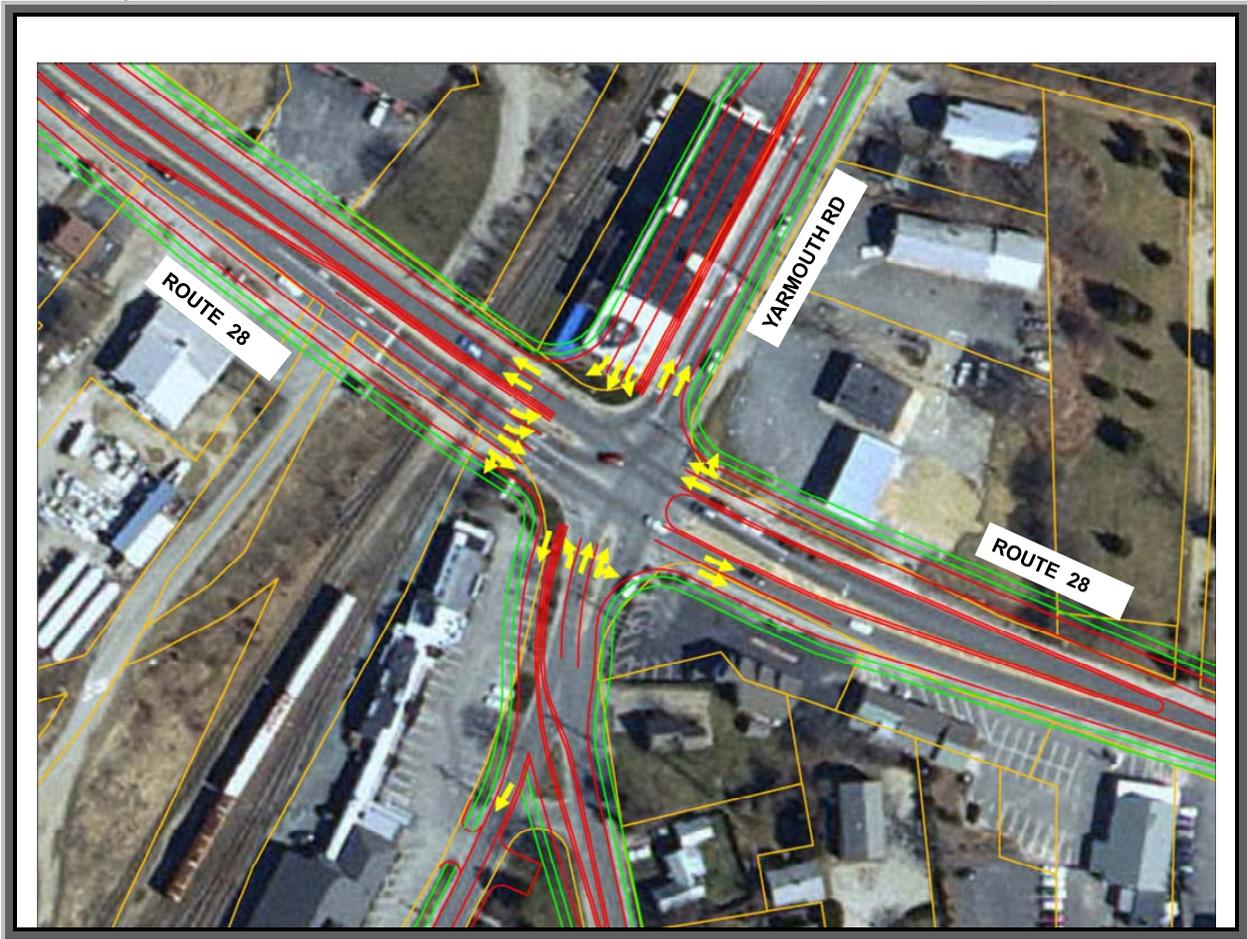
Yarmouth Road/Route 28 Intersection Improvements (West) Lanes
